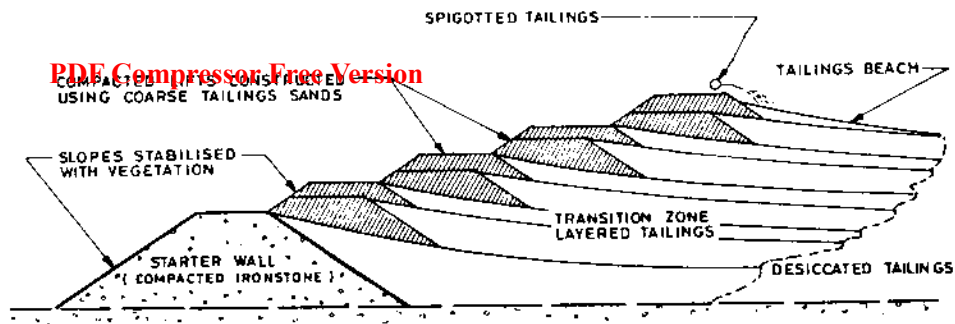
Section of bauxite tailings embankment at Weipa showing upstream construction (Minns 1988).
